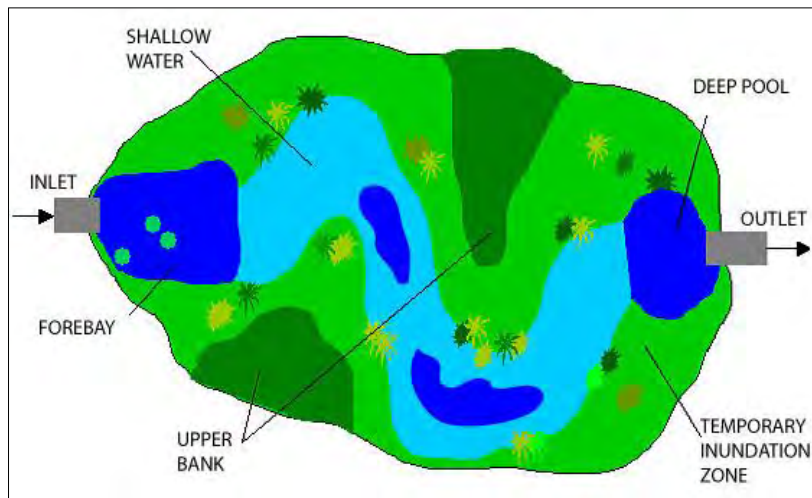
Plan View of a Stormwater Wetland (Hunt, Burchell, Wright, & Bass, 2007)
